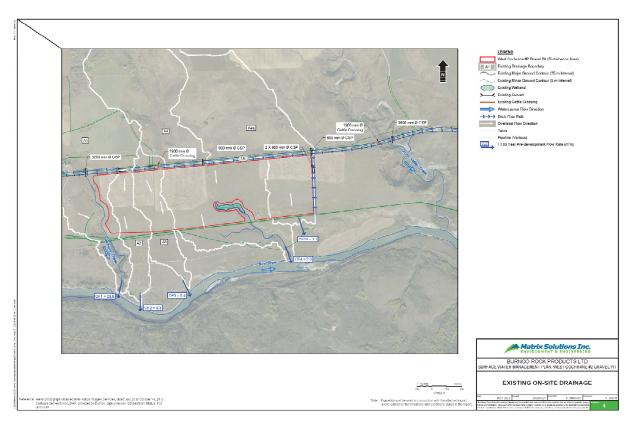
Stormwater Management Plan – Existing On-Site Drainage
